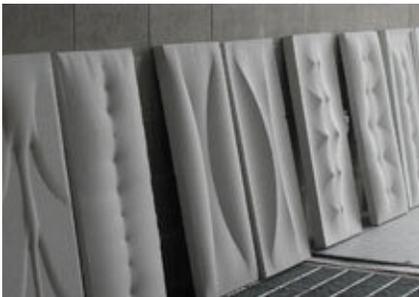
Completed wall panel plaster casts (C.A.S.T. photo)
